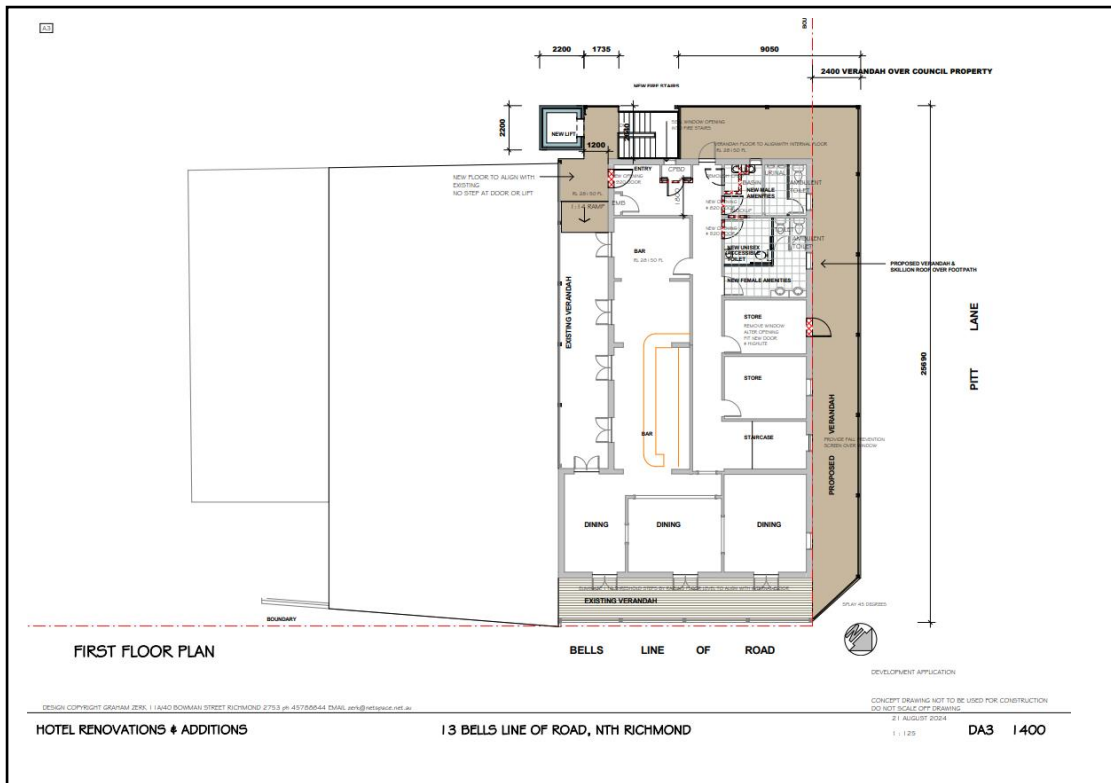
First Floor Plan (Source: Graham Zerk, 21 August 2024).
